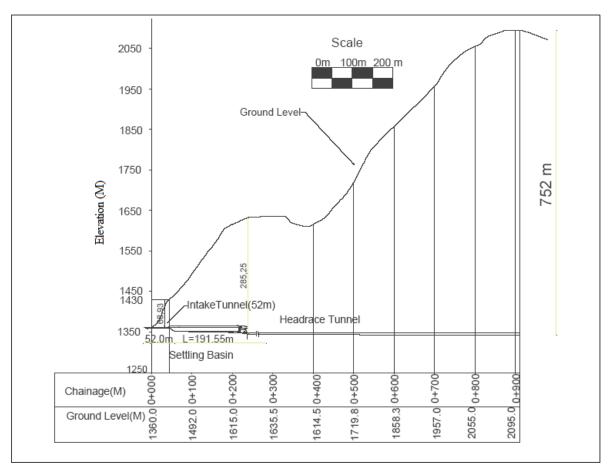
Proposed longitudinal profile of settling basin cavern (Alternative I &II)
